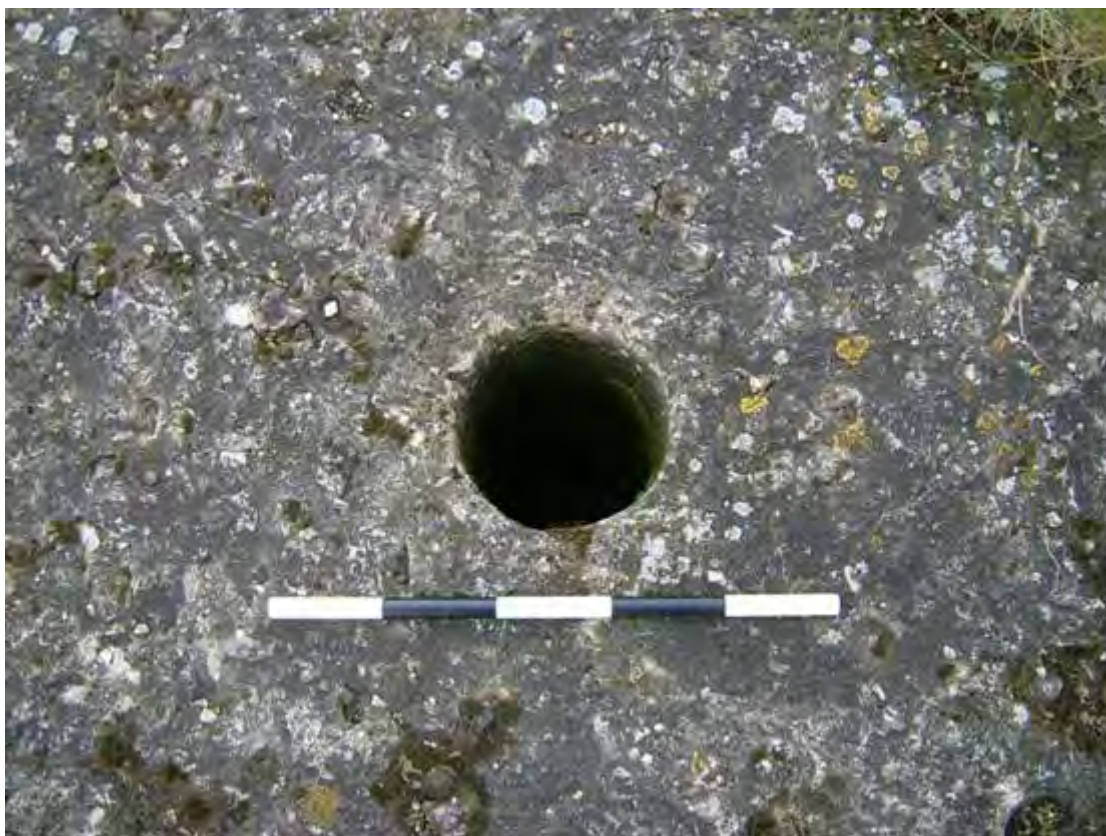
Pillbox SH4, detail of central roof vent (0.5m scale)
